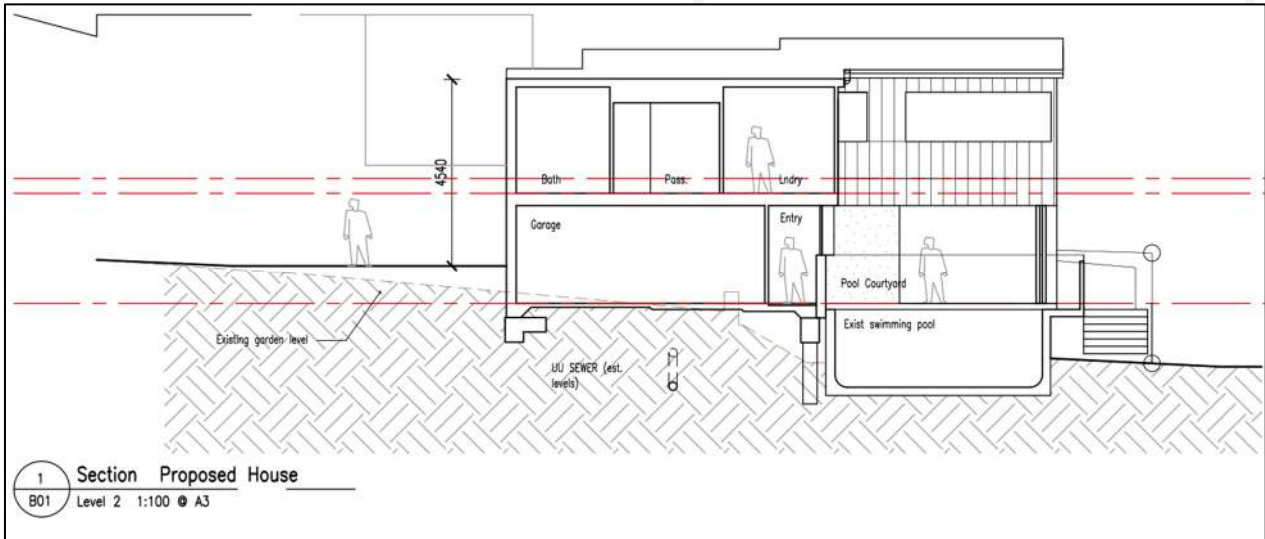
Proposed plans (Source: Source: Price Musgrave Architecture)
